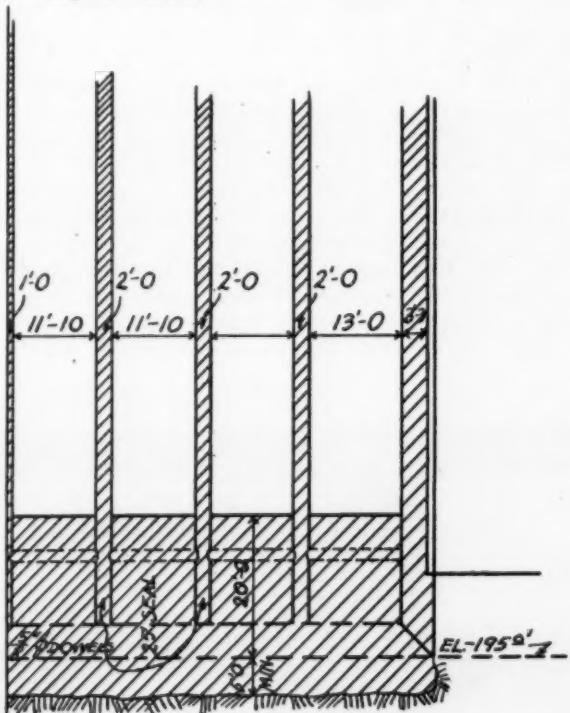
Half Section Drawing of the Bottom of Pier 5 Through the Longitudinal Axis.
